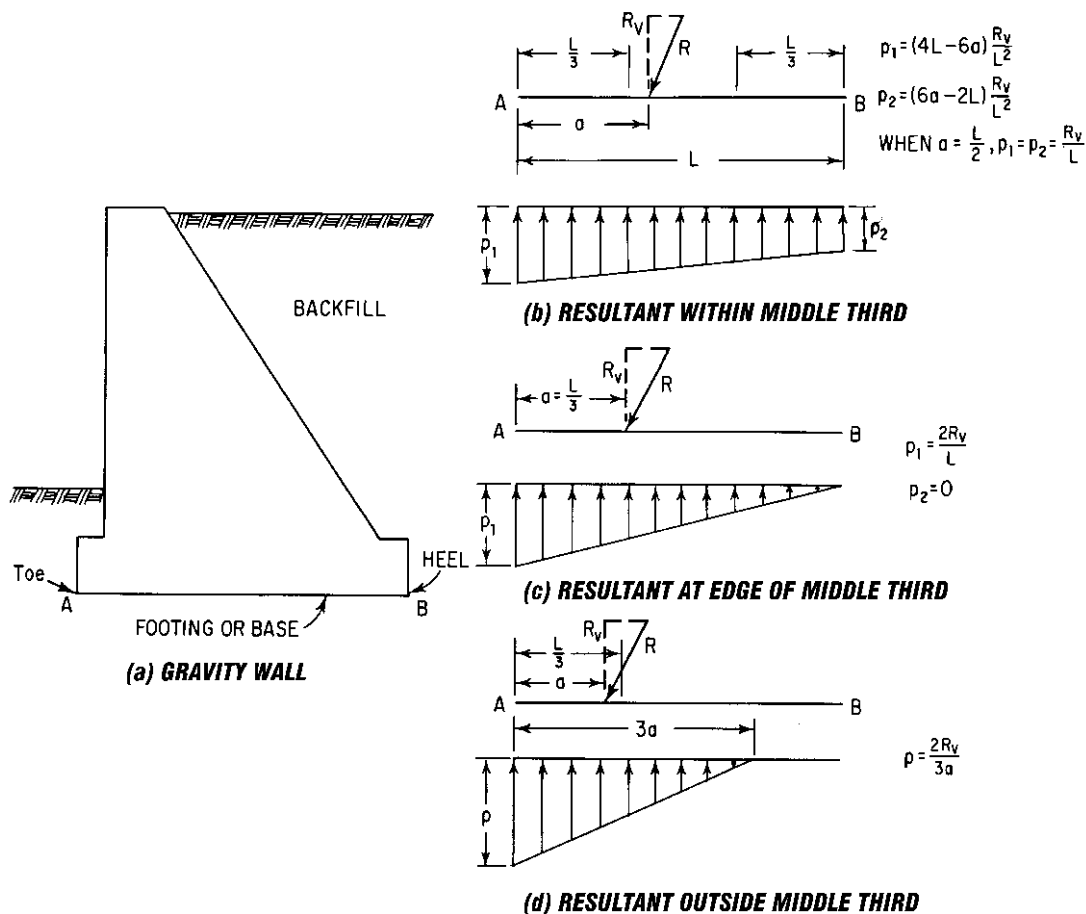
Diagrams for pressure of the base of a concrete gravity wall on the soil below. (a) Vertical section through the wall. (b) Significant compression under the entire base. (c) No compression along one edge of the base. (d) Compression only under part of the base. No support from the soil under the rest of the beam.
